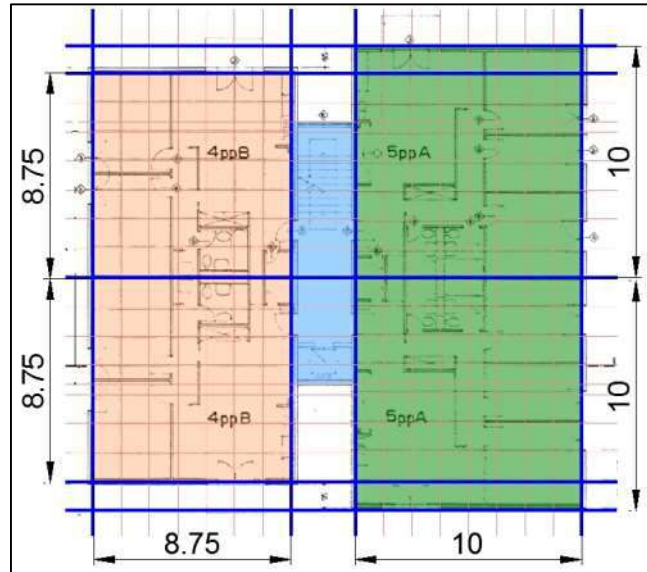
Typical floor Plan. Dimensions of the 3 identical boxes.
